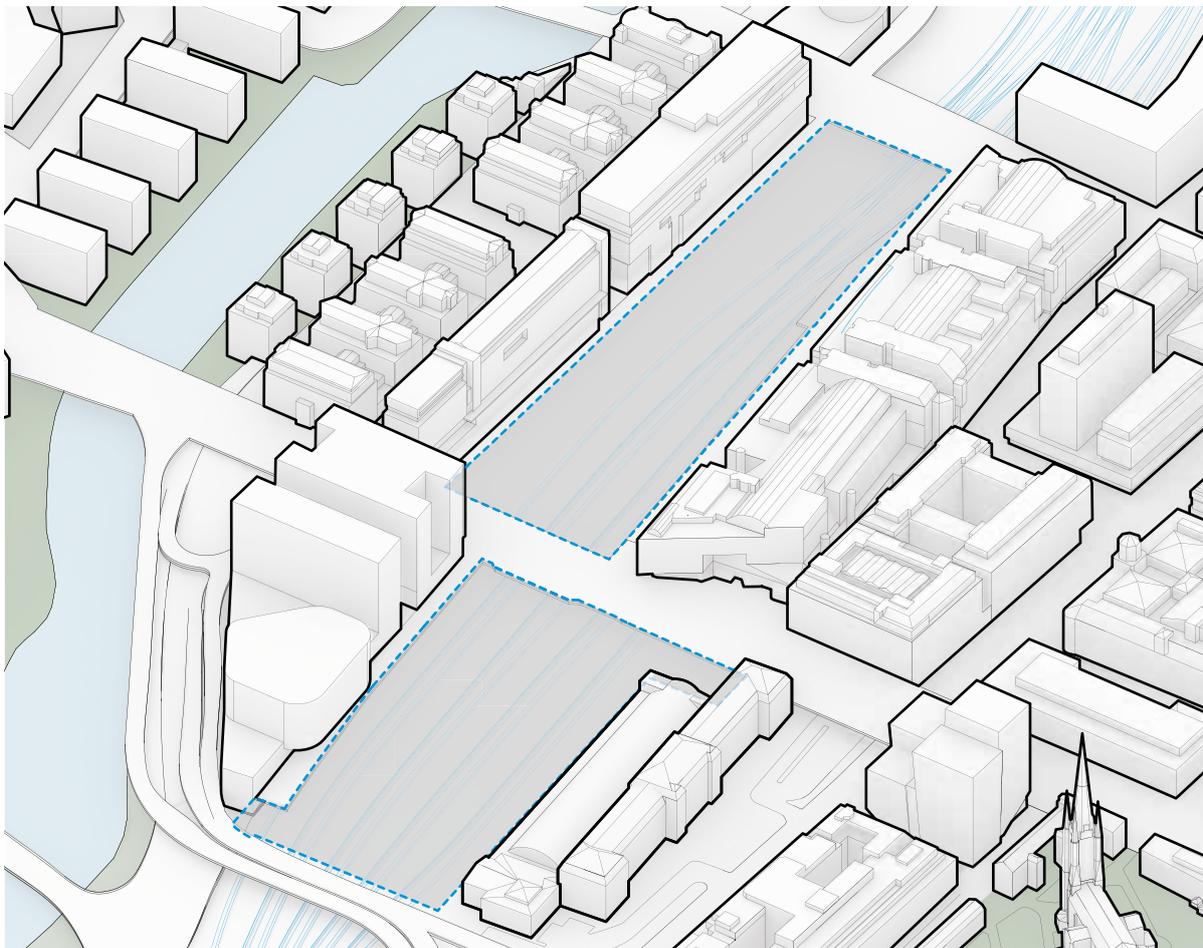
The commission starting point; new track area, overbuild, the A & B -house.
